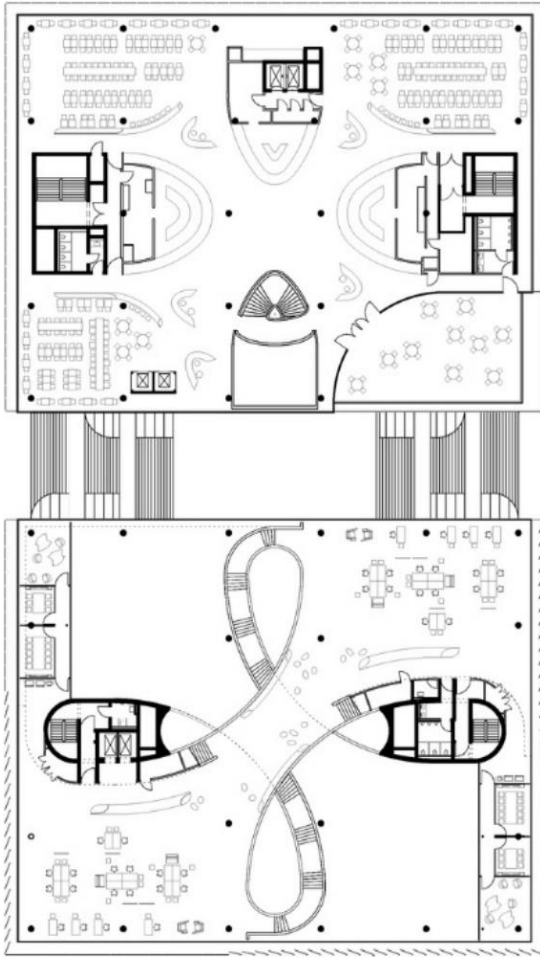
SECOND FLOOR PLAN (HENN, 2018)
